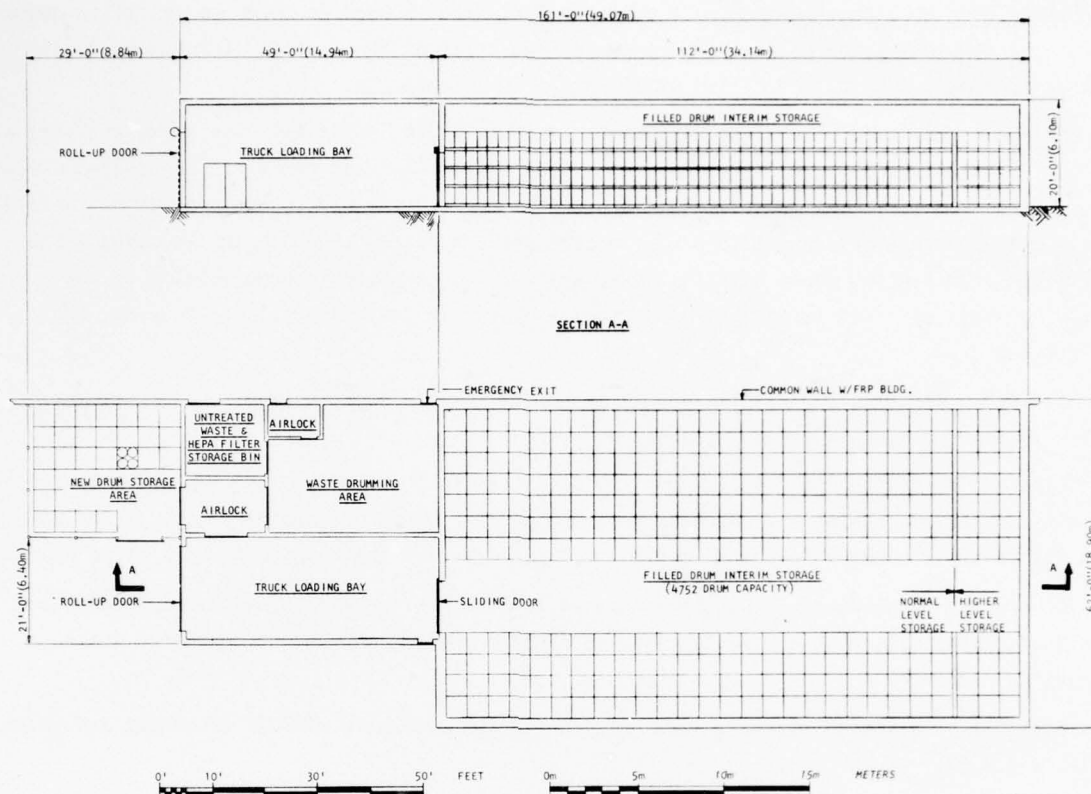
Facility for LLW Packaging Without Treatment Facility at the Fuel Reprocessing Plant, General Plan and Section A-A
